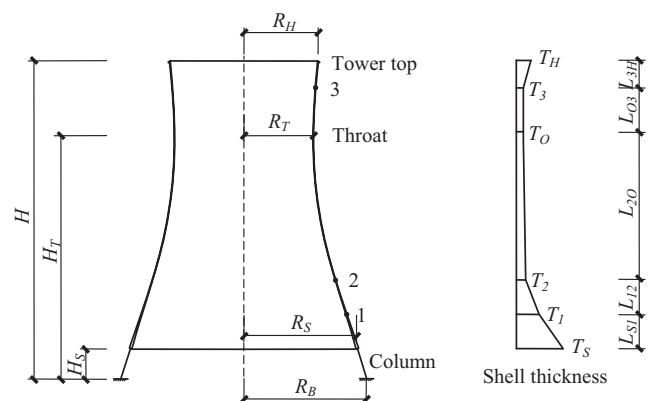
Definitions of geometry and dimensions of the super-large cooling tower.
